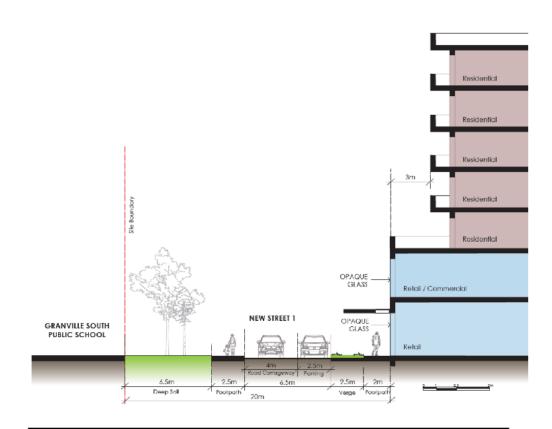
New Street 1 Setbacks (Section C-C)
